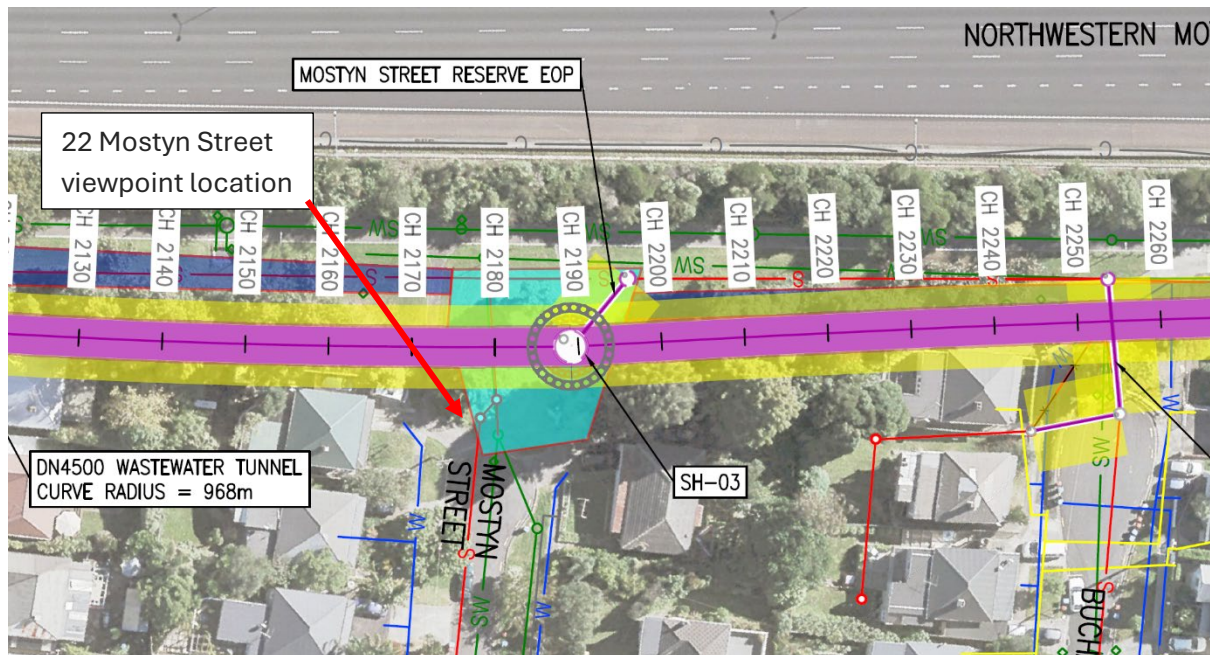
SH03 shaft and Buchanan Street wastewater connection location plan
